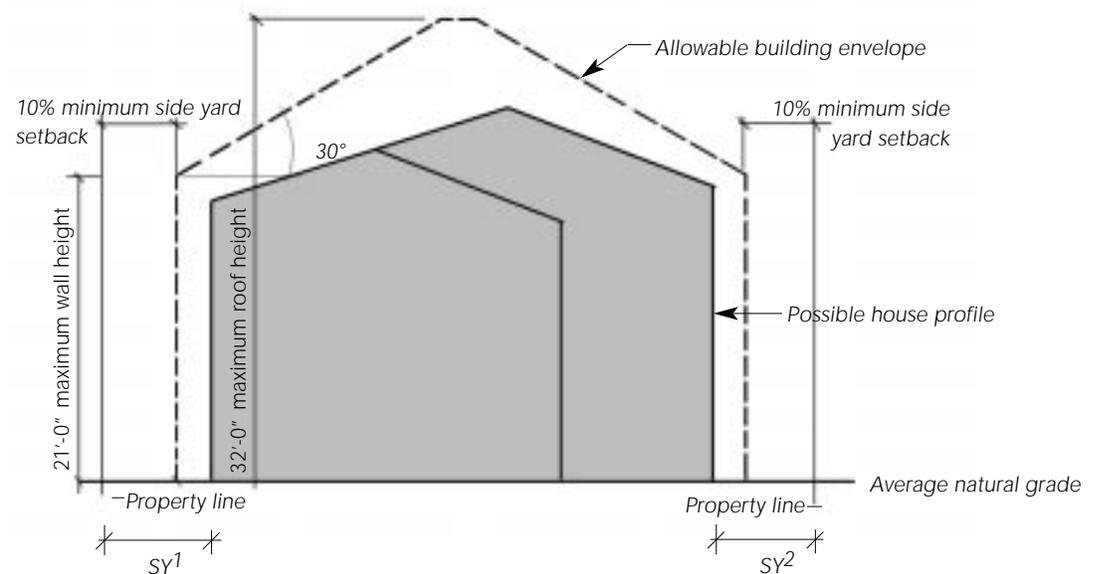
Additional side yard setback above 21 feet. (See Fig. 7a for side yard setback requirements.)
